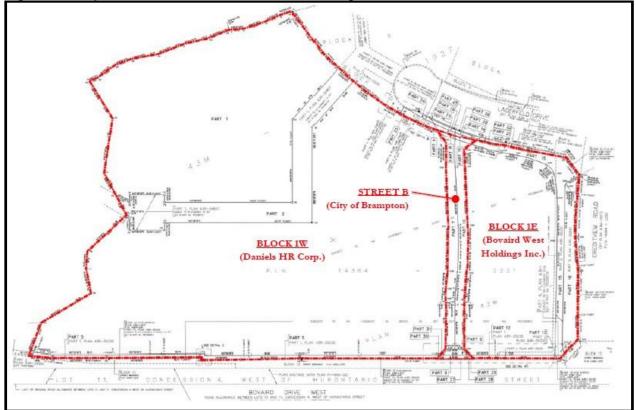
Proposed Street B from Bovaird Drive to Lagerfeld Drive
